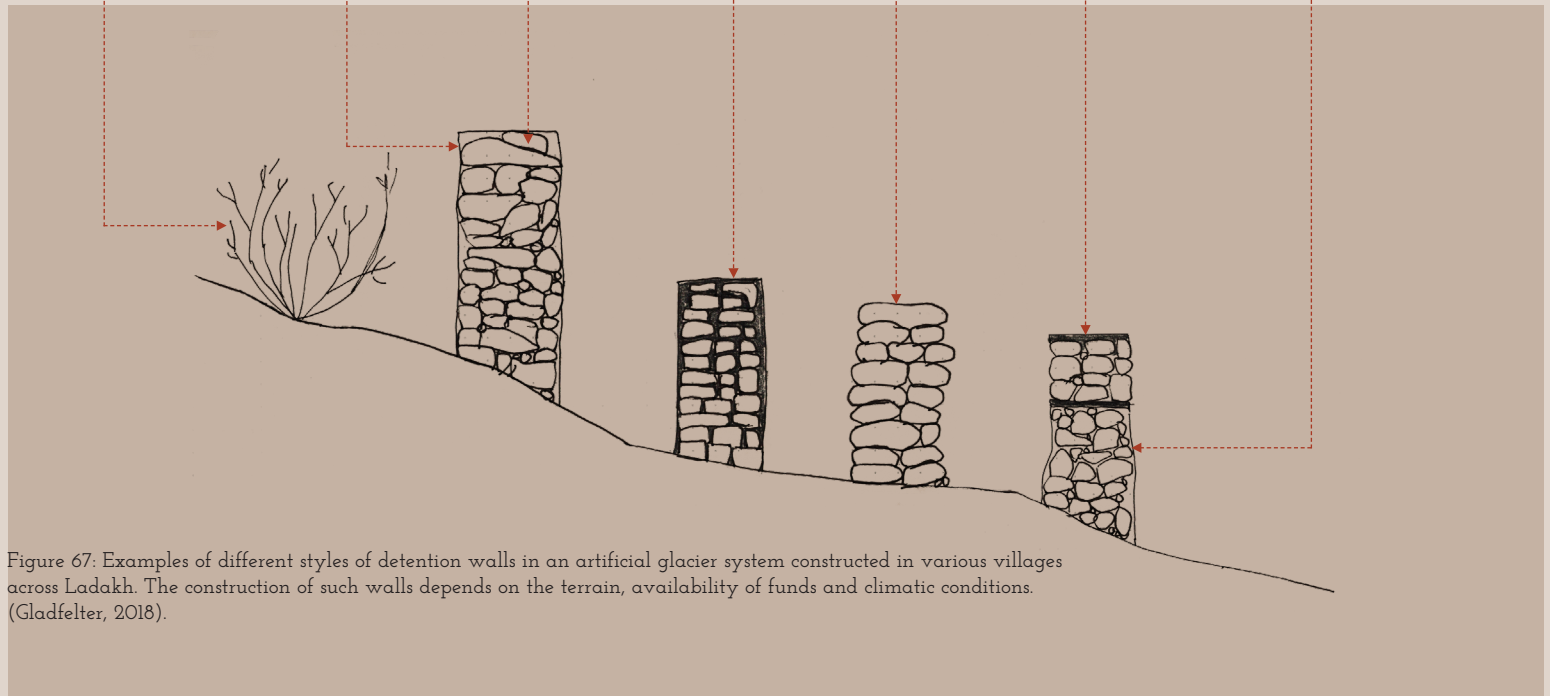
Examples of different styles of detention walls in an artificial glacier system constructed in various villages across Ladakh. The construction of such walls depends on the terrain, availability of funds and climatic conditions. (Gladfelter, 2018).
